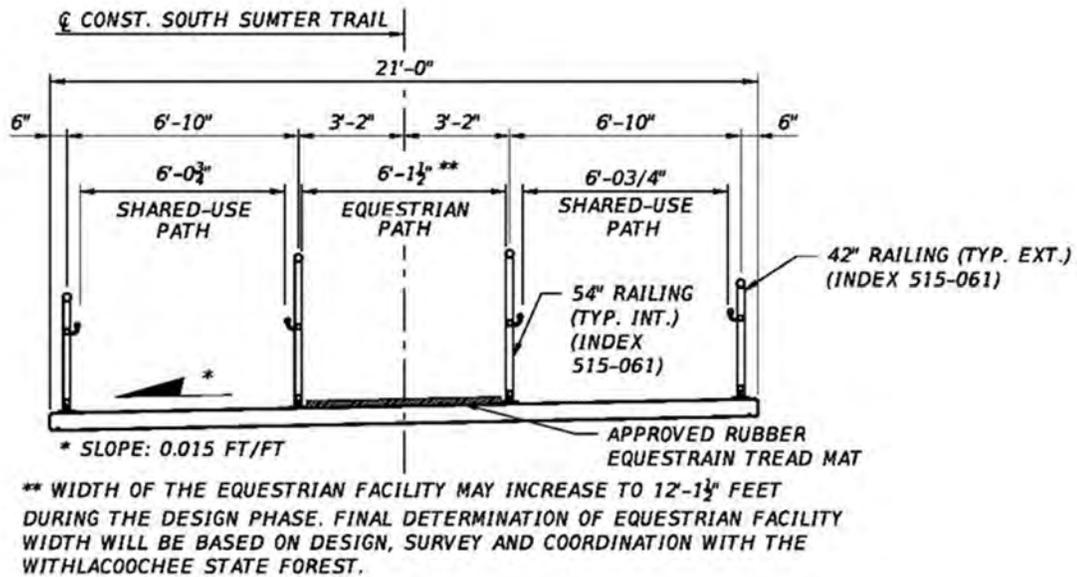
Typical Section – Approach Ramps to Withlacoochee River Crossing
